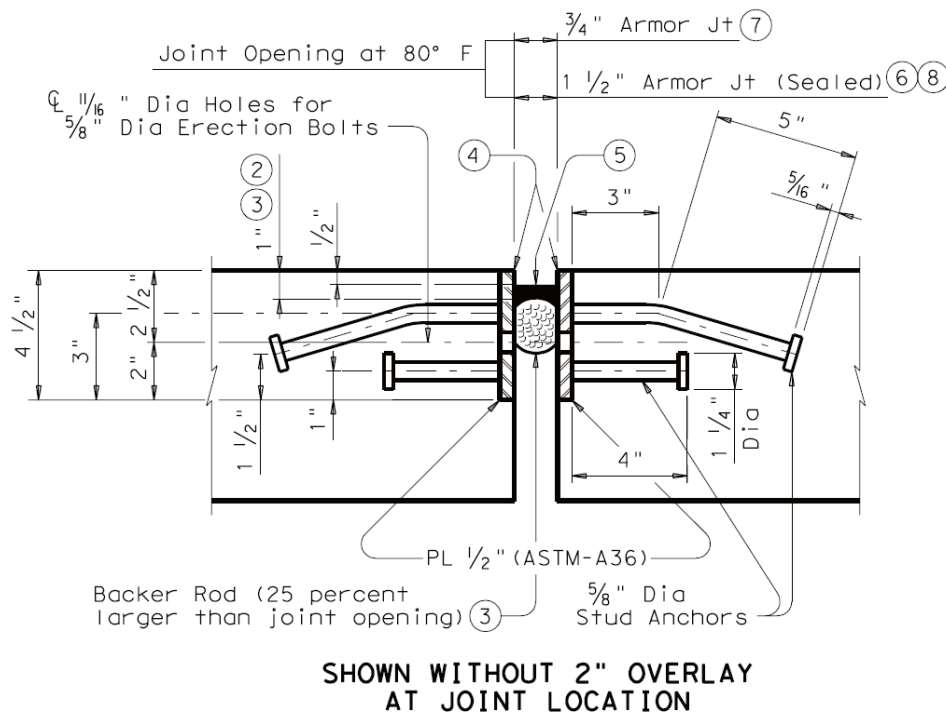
Cross Section of TxDOT Armor Joint Rail (TxDOT)
